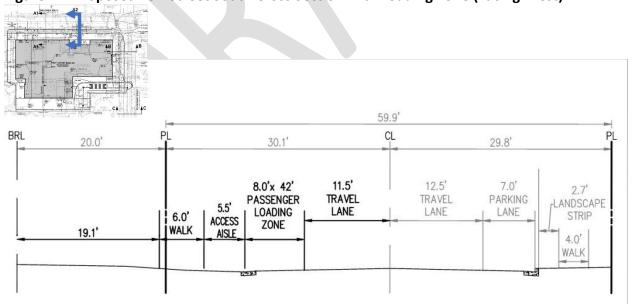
Proposed 23<sup>rd</sup> Street South Cross Section (Facing West)
